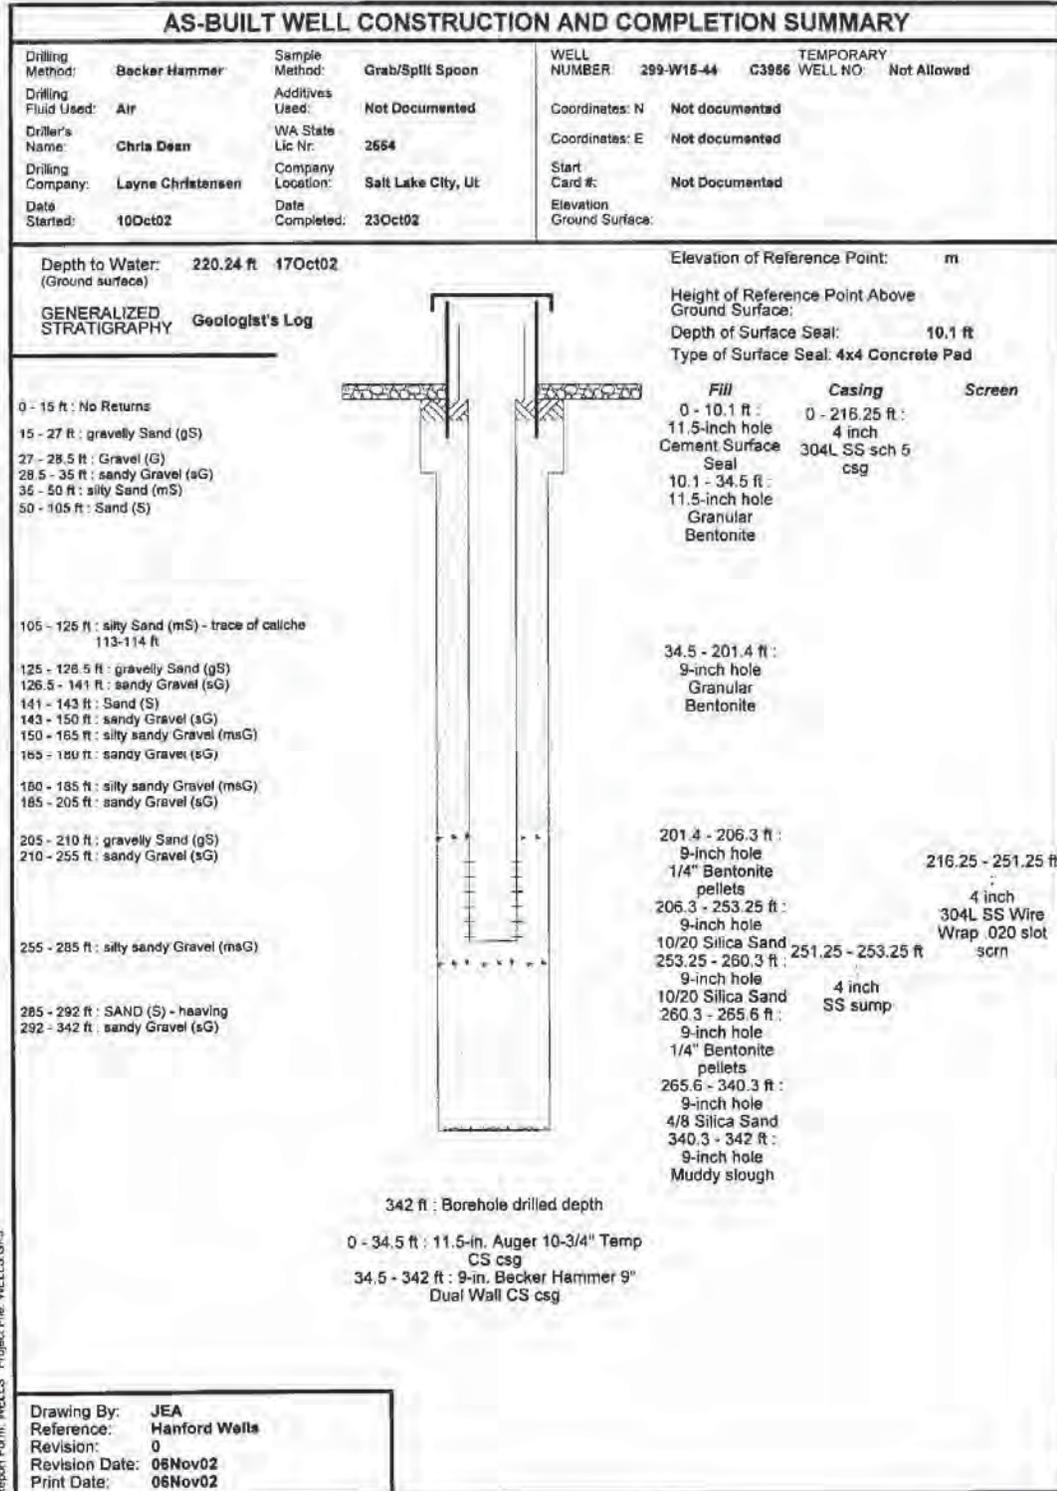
Well 299-W15-44 Construction and Completion Summary
